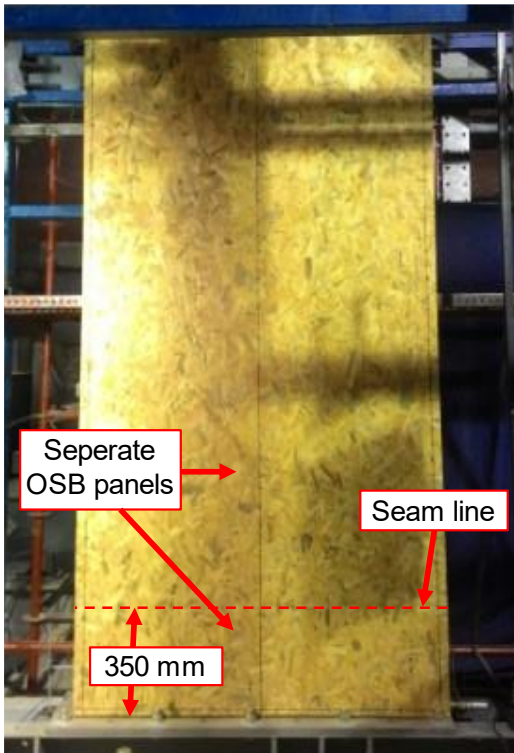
Sheathing configuration and gravity loading used in Specimen-7
